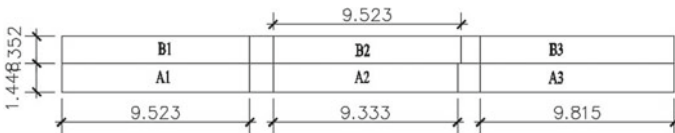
Sides view of optimized designed blocks for the draft tube structure (m)
